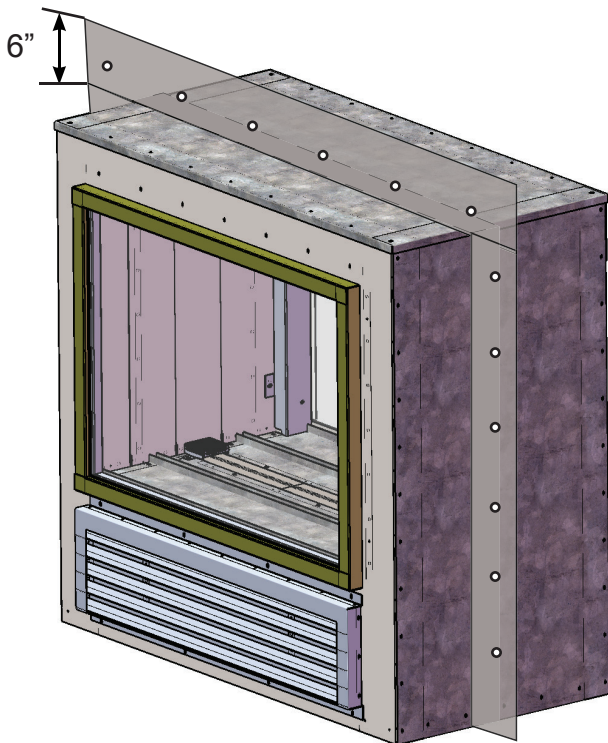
Attach flashing to unit using sheet metal screws provided, apply a bead of silicone to flashing where it meets the unit
